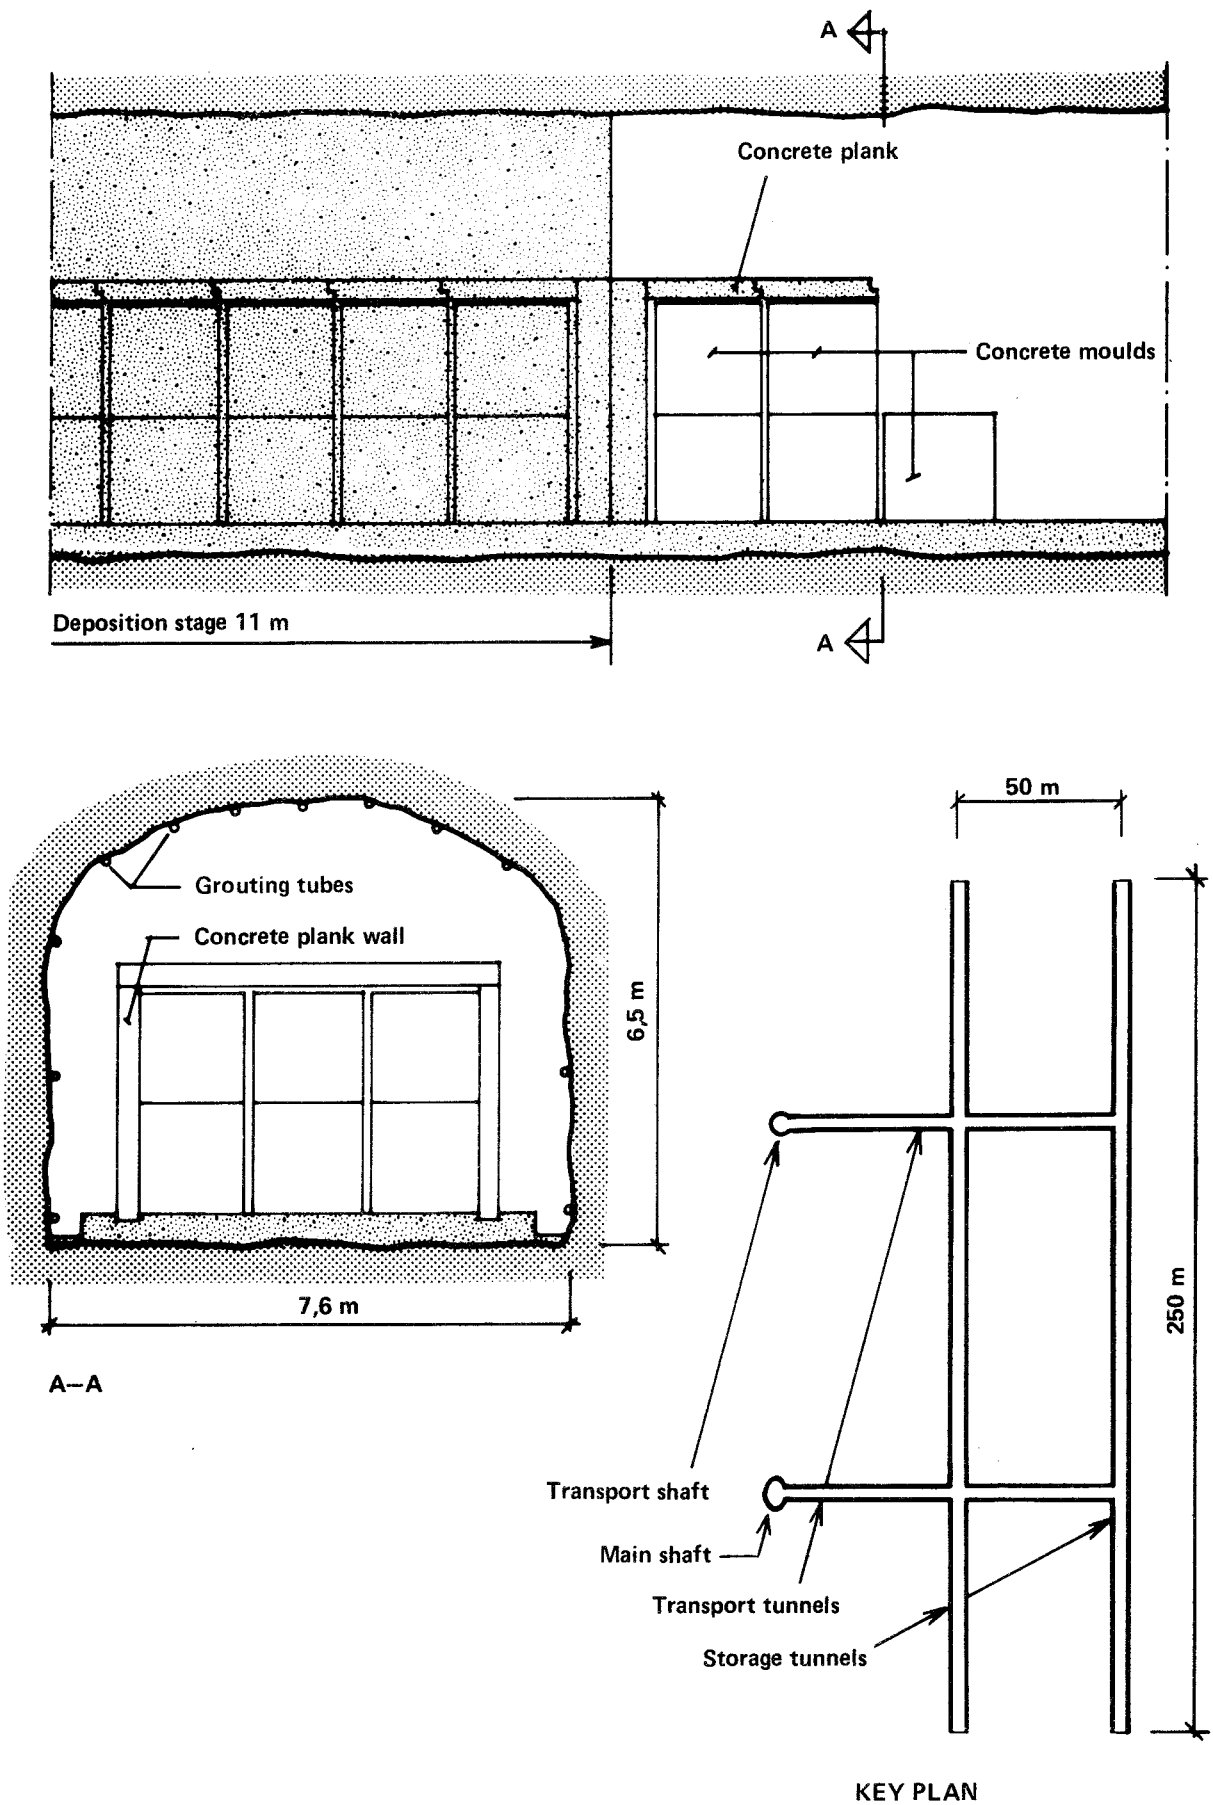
Final storage for concrete containers with radioactive metal pieces from the fuel elements. The sealing of the storage will be executed instages of 11 meters by filling up the tunnel with concrete. To guarantee good contact between concrete and rock, cement grout will be injected through pipes along the rock surface.
